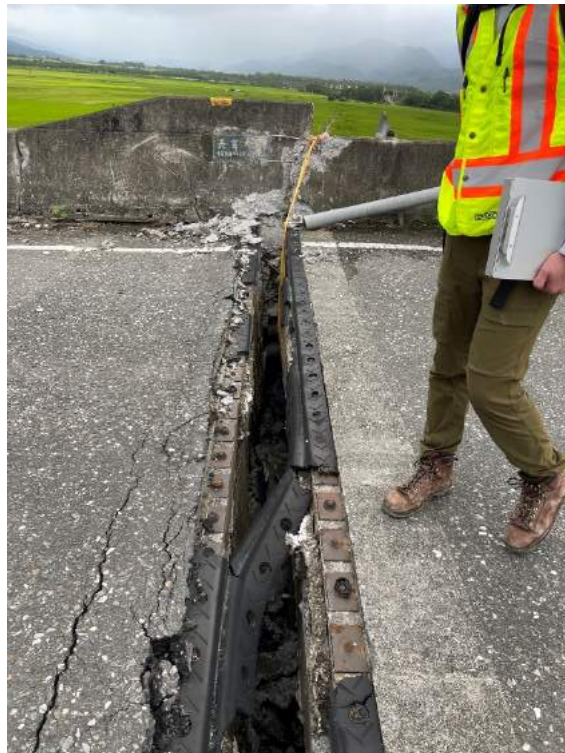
Extension of bridge joint at the west abutment. Gap approximately 25 cm. (23.26574° 121.29864°)
